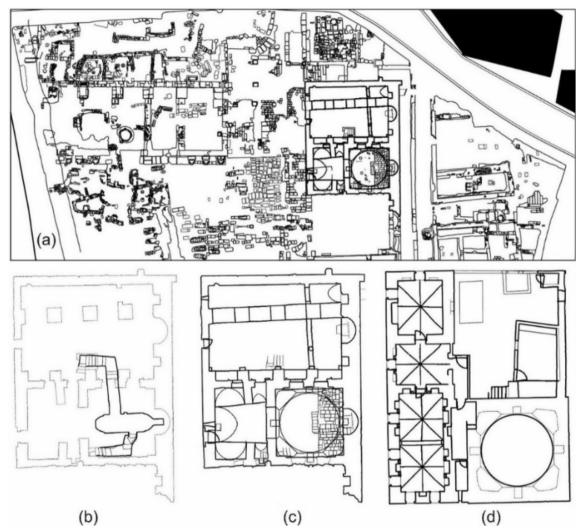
Measured drawings of the Mor Yakup Church. a Plan of measured drawing of Church, b – 4.00 level plan of church, c 0.00 level plan of church, d + 7.50 level plan of church [18]
